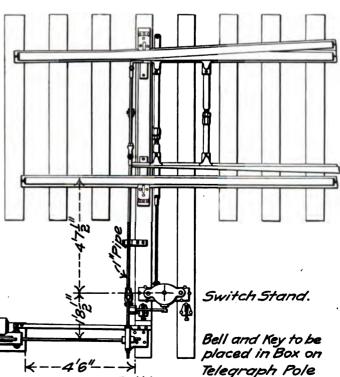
Hand Switch, Bolt Locked by Dwarf Machine. New York Central & Hudson River.
